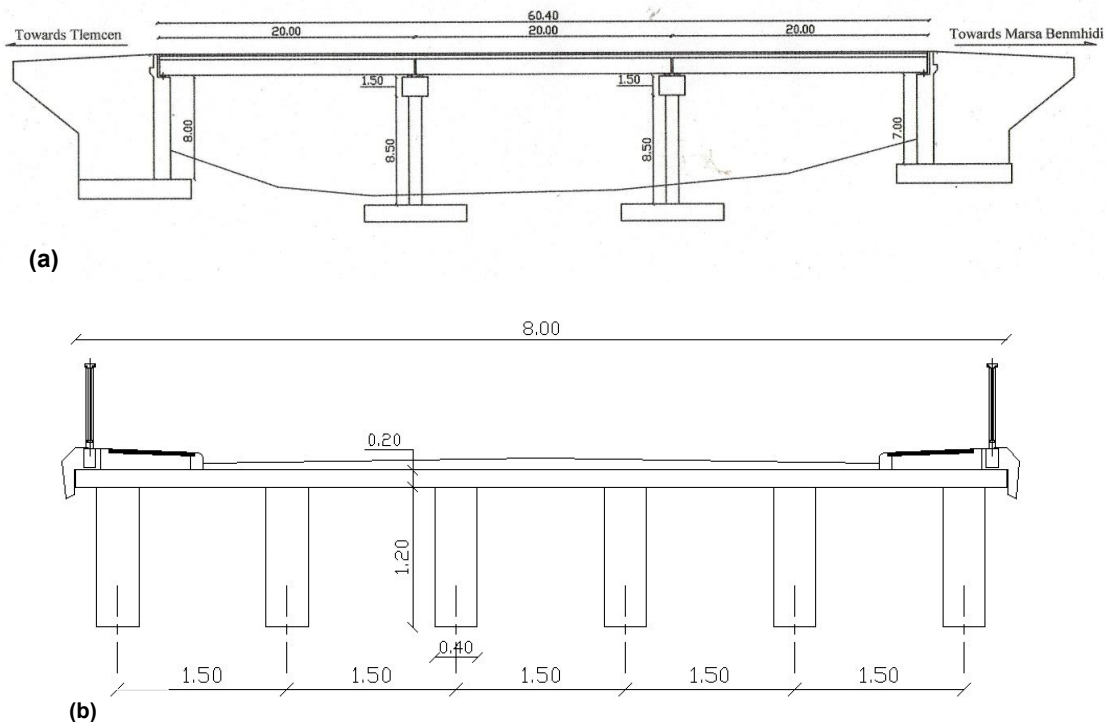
Schematic drawings for the Bridge over Oued Mouilah RN 7A, (a) Longitudinal section., (b) Cross-section of the deck.
